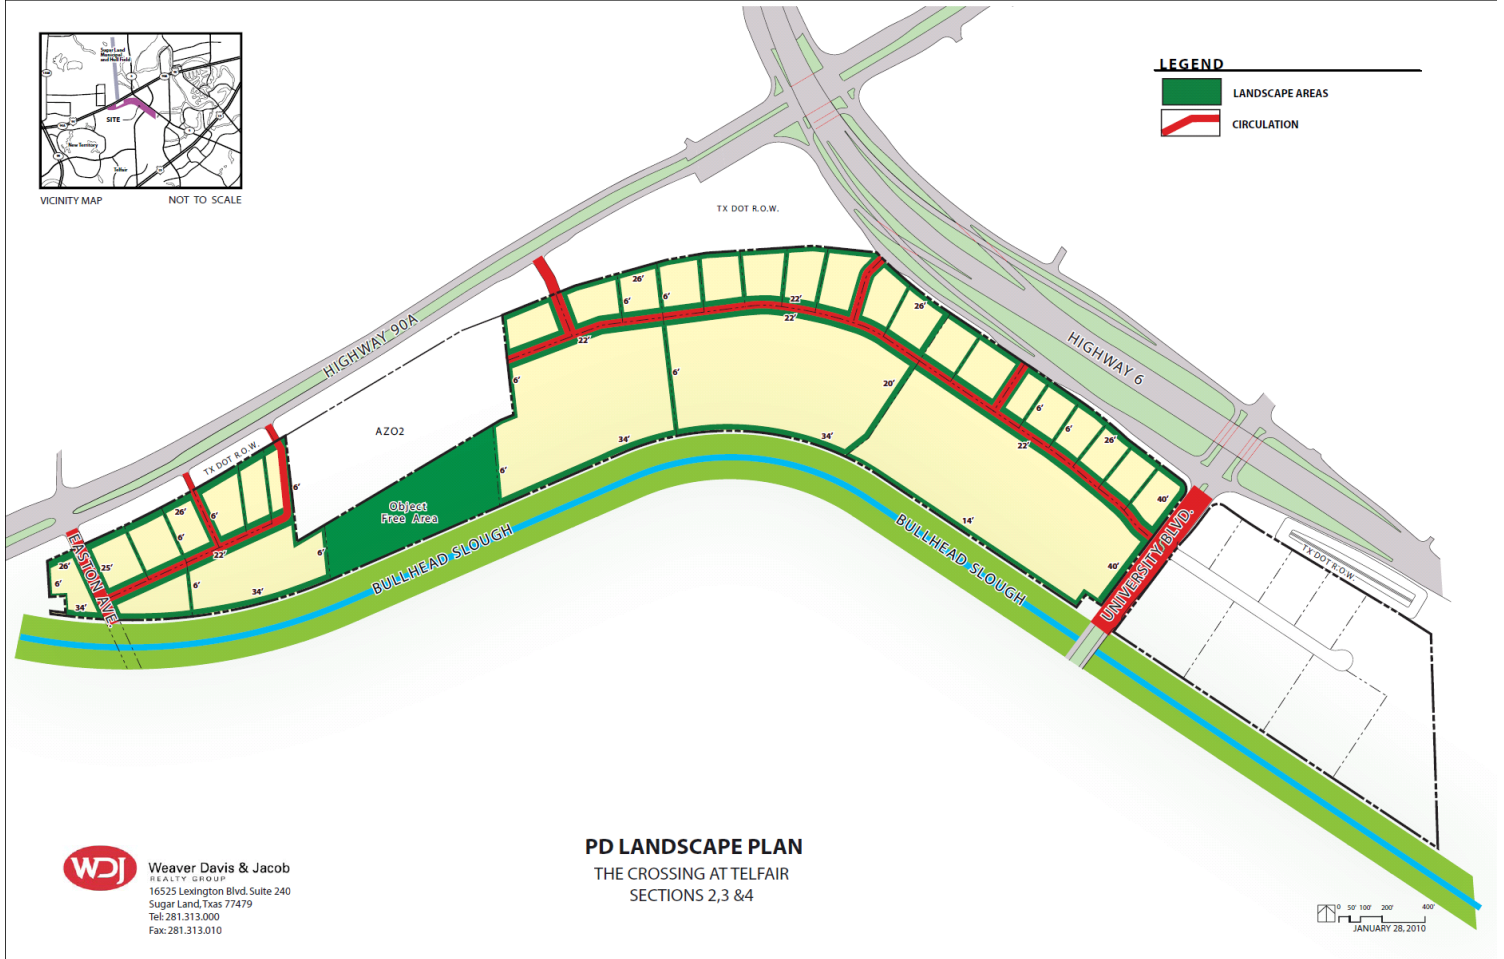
LANDSCAPE PLAN OPTION B
